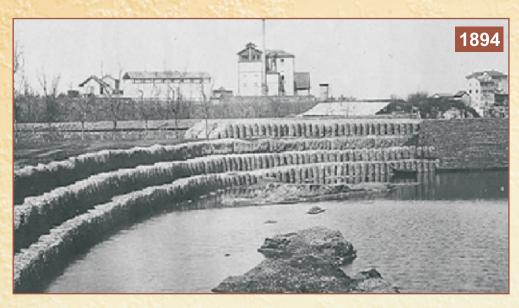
, b & c: Photograph depicts mechanical woven Gabions to protect Reno river bank
